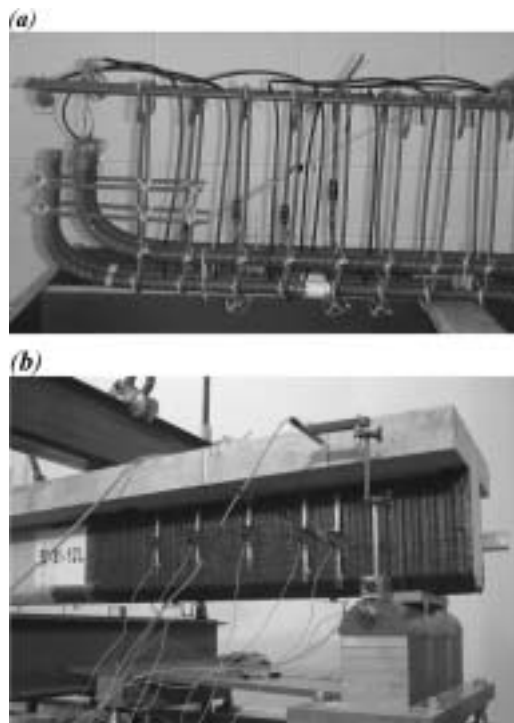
Instrumentation: (a) strain gauges on transverse and longitudinal steel and embedded in concrete; and (b) crack gauges on CFRP.
